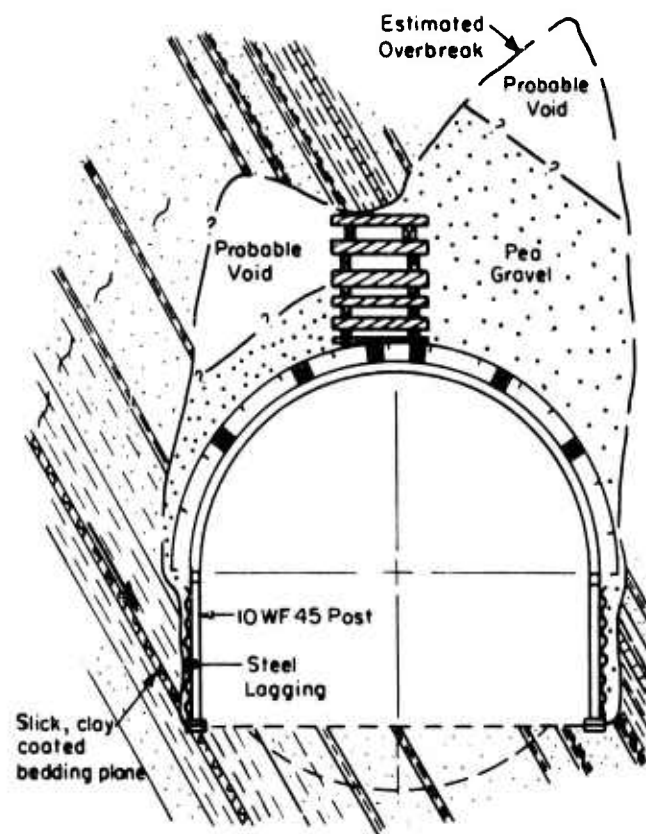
C REMOVAL OF BENCH SECTION - CASTAIC DIVERSION TUNNEL. (after Arnold et al., 1972)
